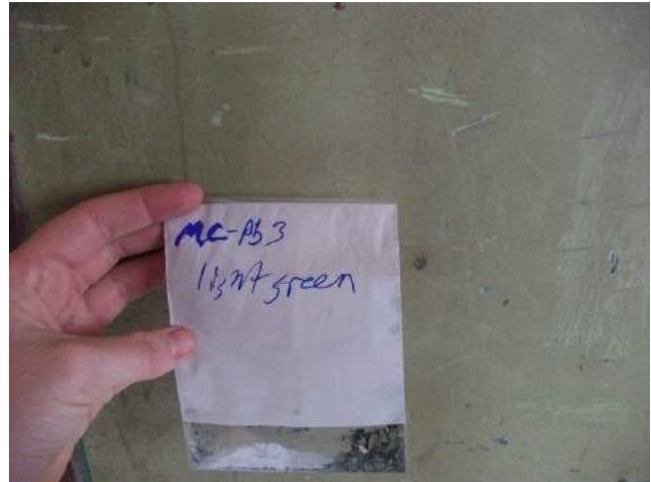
Metal Clad Storage Building at CCGB Prescott
